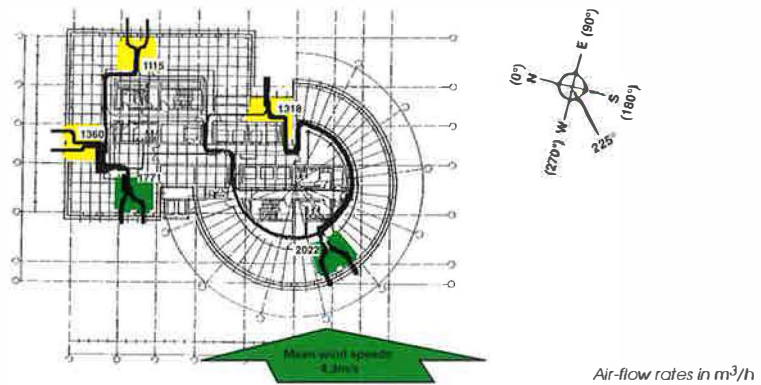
Air-flow rates through the building, office doors opened, south-west wind
